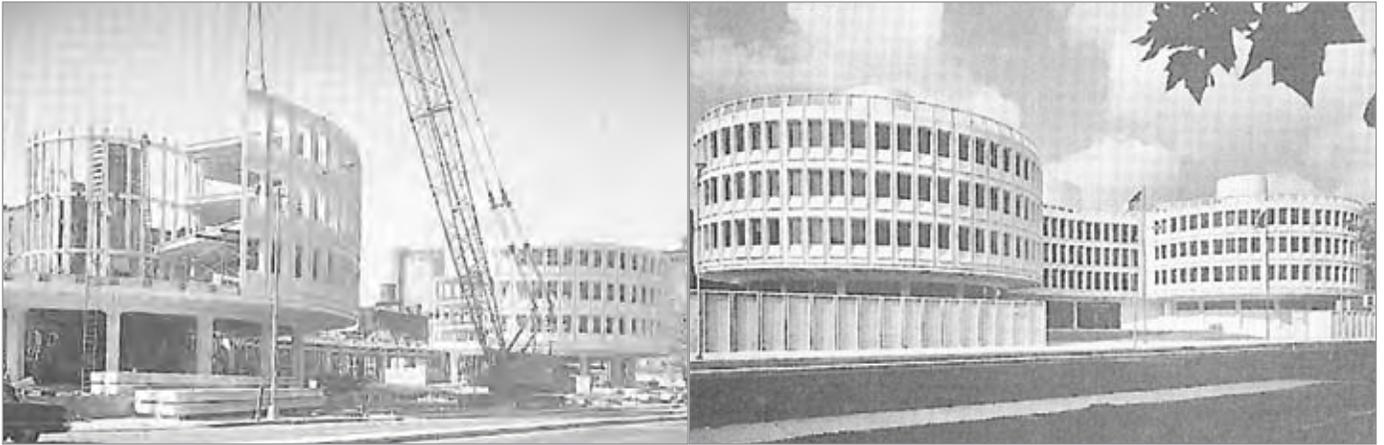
PHILADELPHIA POLICE ADMINISTRATION. | PRECAST/PRESTRESSED CONCRETE INSTITUTE.
